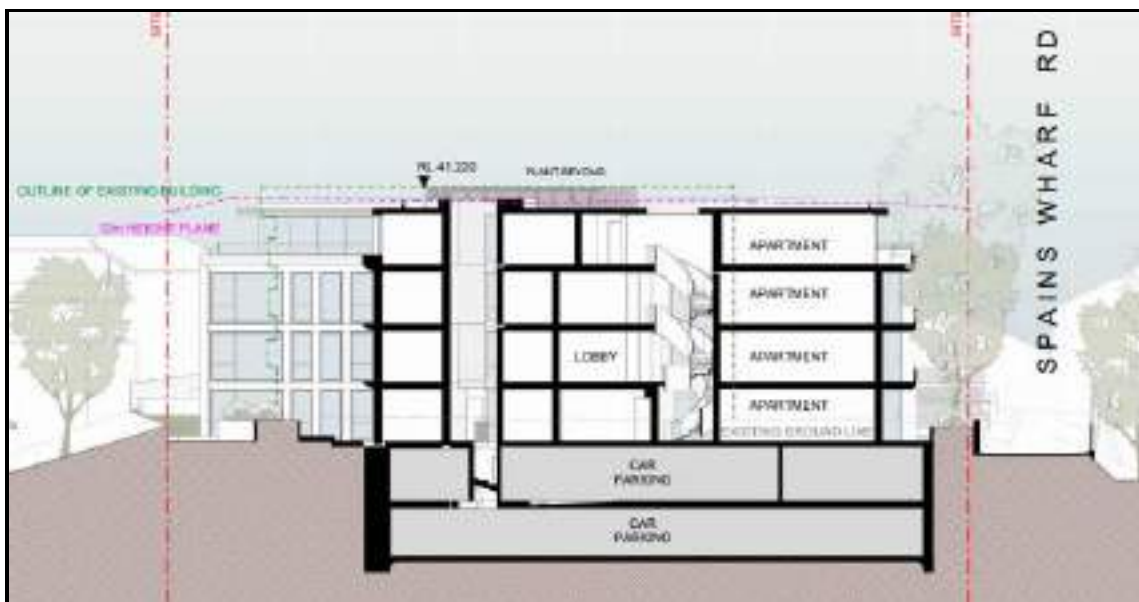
Section of building showing the 12m maximum height limit, existing building outline and proposed building outline (Source: SJB Architects).
